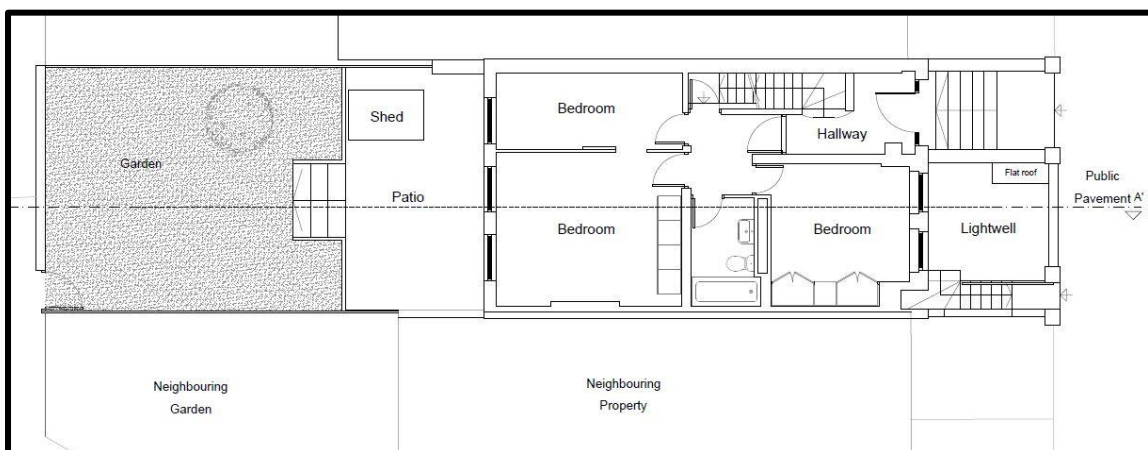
Existing Ground Floor Plan - Flat 1, 3 Carlingford Road, Hampstead
